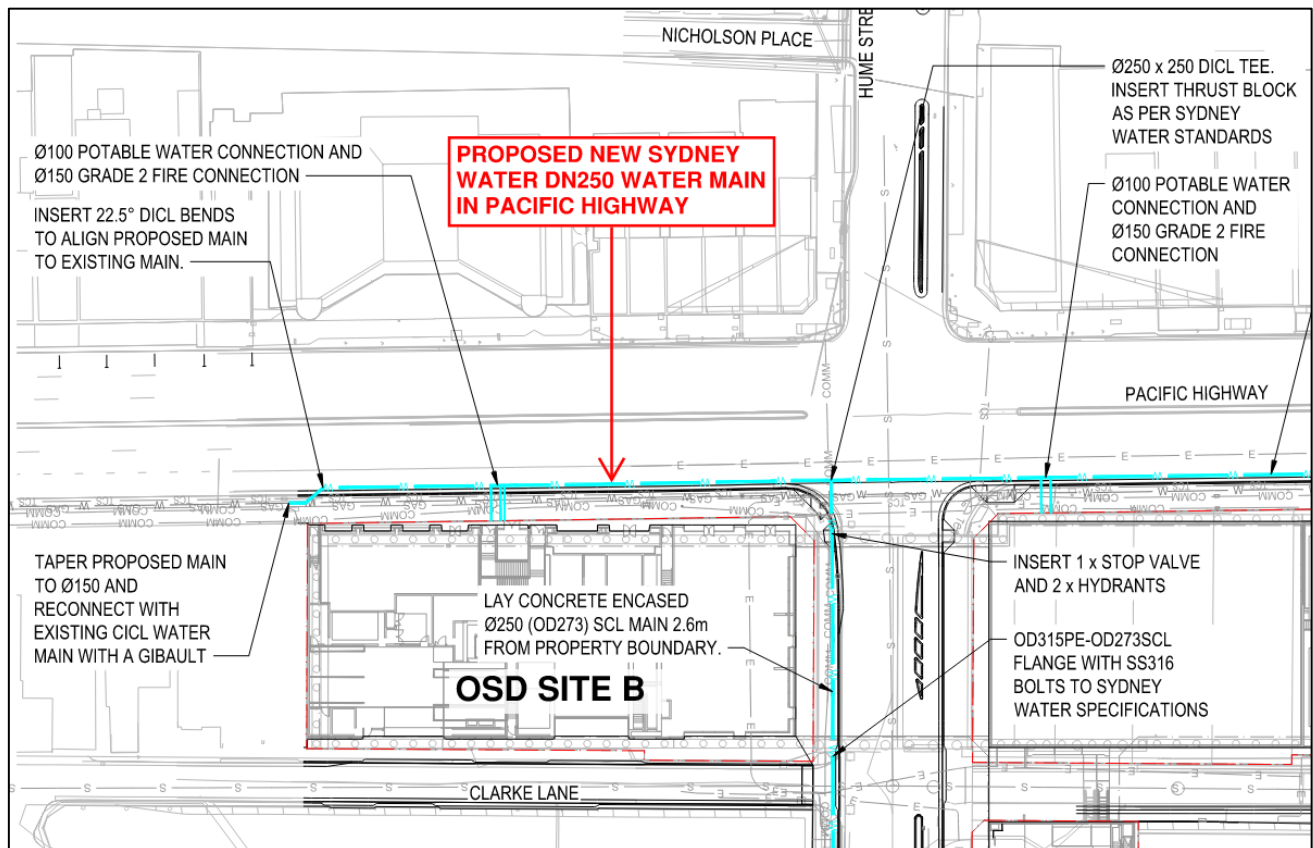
Sydney Metro Crows Nest – Proposed Utilities Plan – showing proposed new DN250 Sydney Water main along OSD Site B frontage
